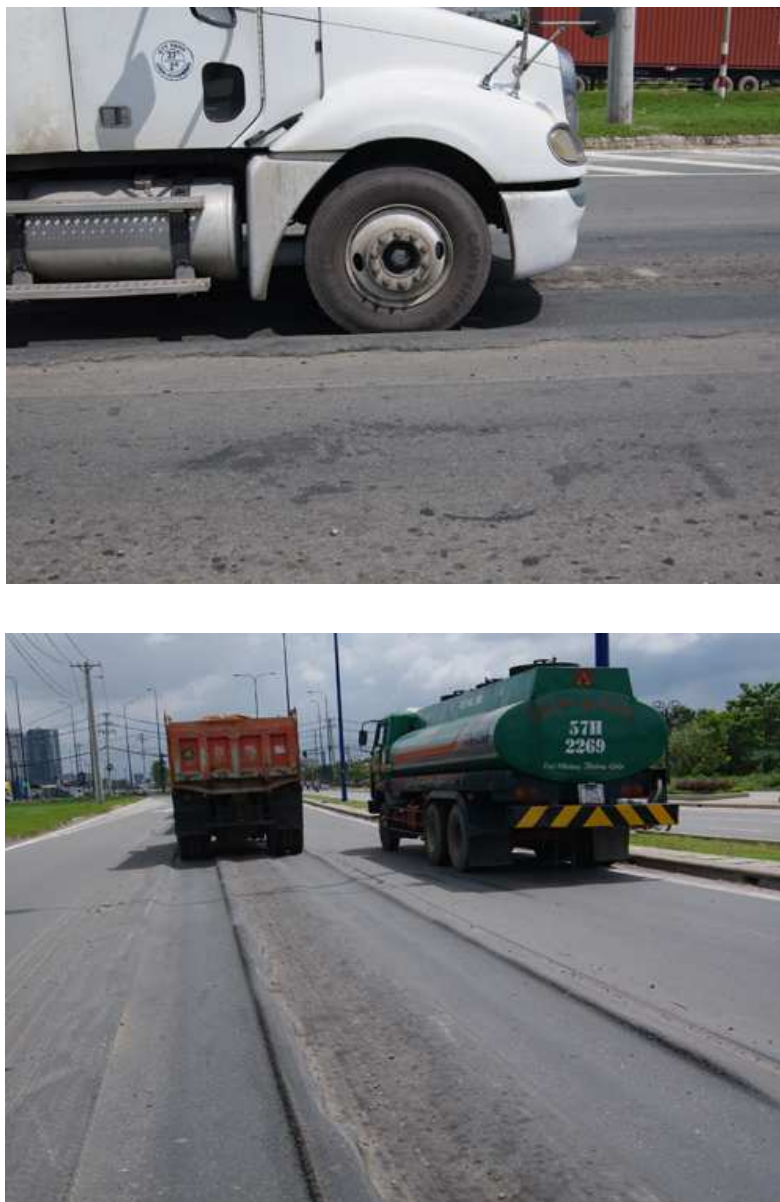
Rutting in the highway “Vostok-Zapad” constructed in 2009
